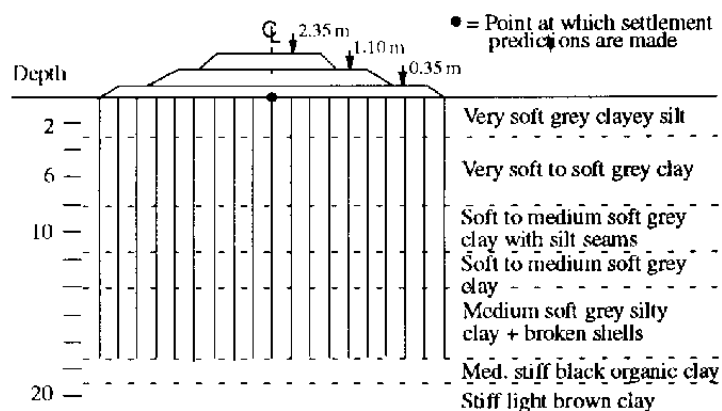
Cross section through centerline of embankment with sub-soil profile at Naval Dockyard.
